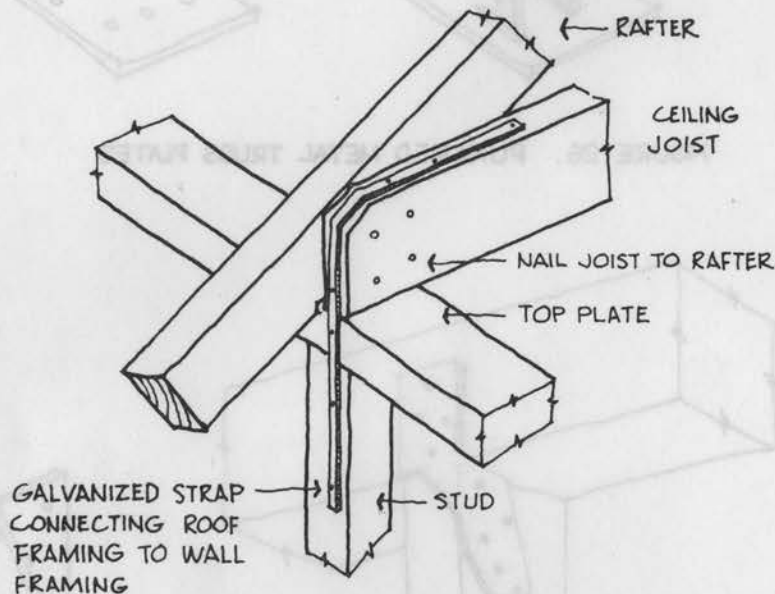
ROOF FRAMING CONNECTION TO WALL FRAMING
